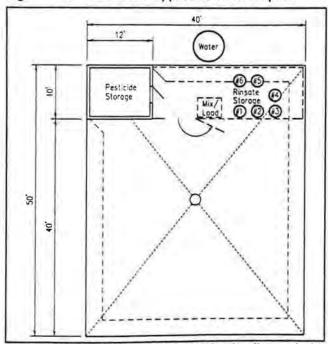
Rectangular single sump mixing/loading pad with storage building and fenced pesticide security area.
